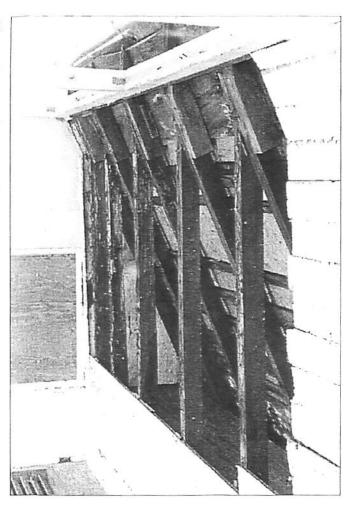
View of the underside of the ceiling of the wraparound porch. Note the sistered porch roof rafters and the insect damage on the roof joists.
